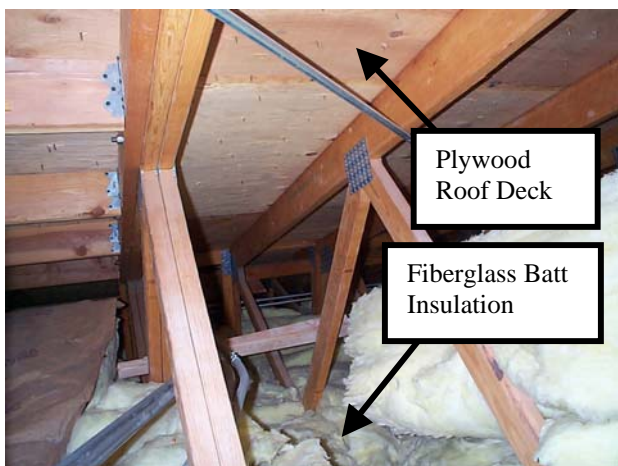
Attic Type Space between the Roof and Primary Air Barrier
